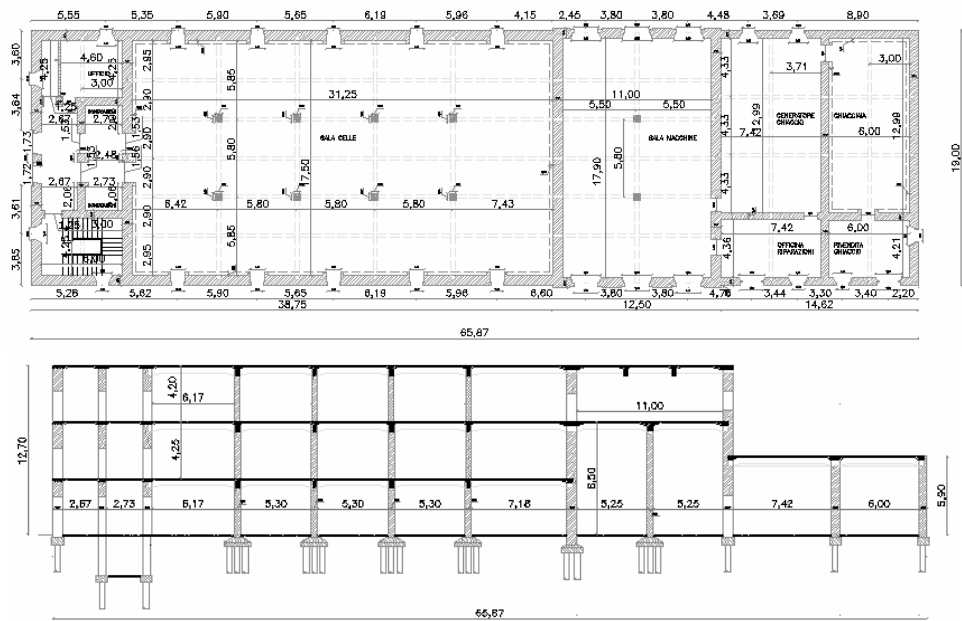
Mixed masonry-r.c. building: plan and section of the Ex-Slaughterhouse in Rome.
